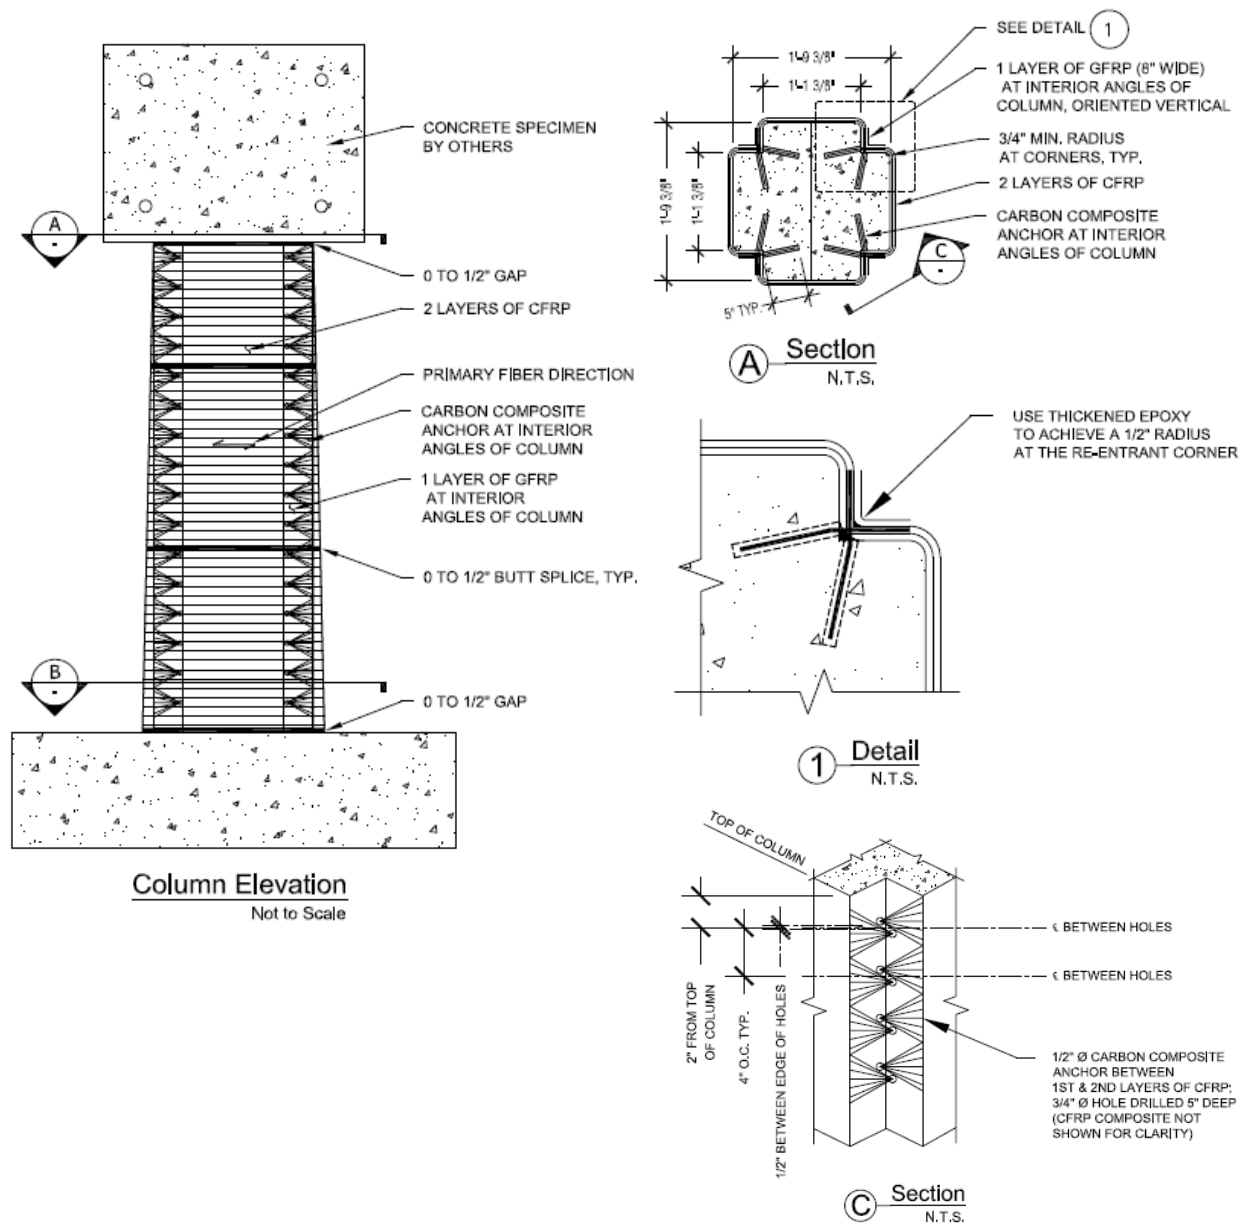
FRP Anchor Retrofit Details (1 in. = 25.4 mm)
